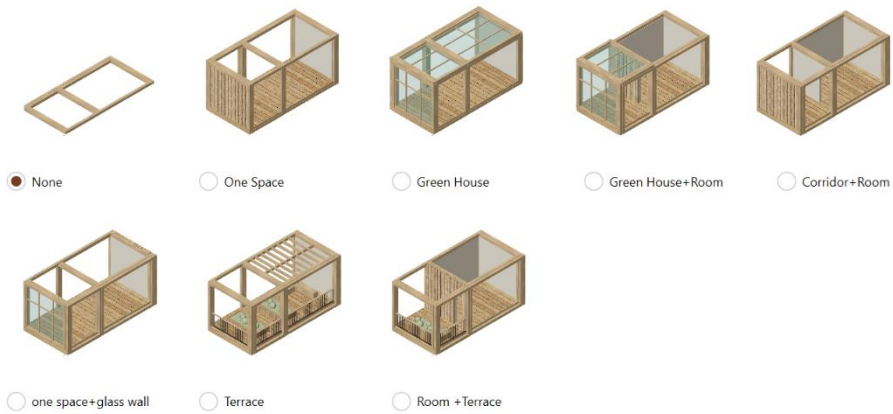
First Floor Addition: Configurator Layout and Section Options (Front Part) (by the author)
